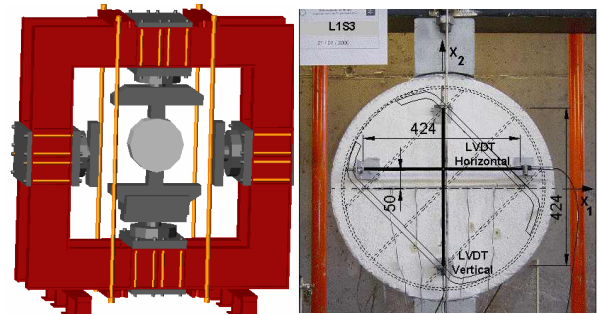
(a) Equipment and (b) test setup (dimensions in mm)
